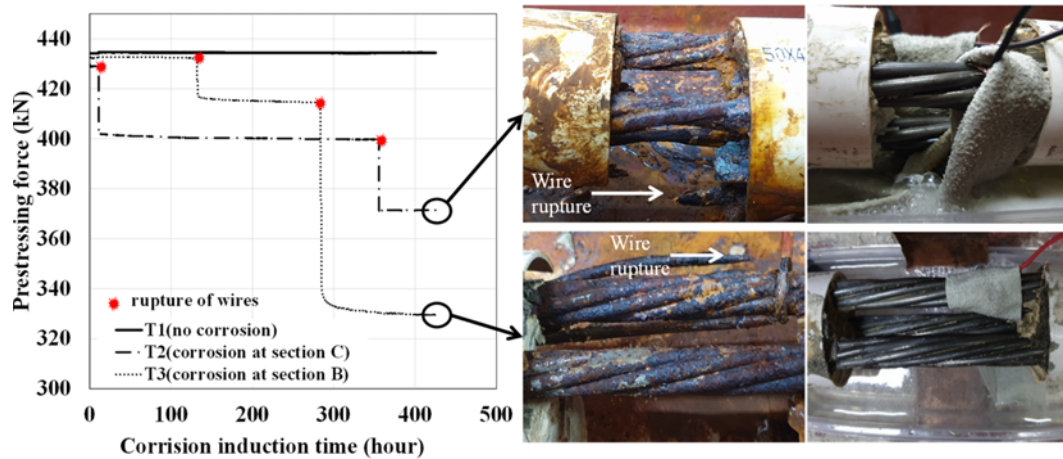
Prestressing Force Change and Pictures of Specimens during the Corrosion Test
